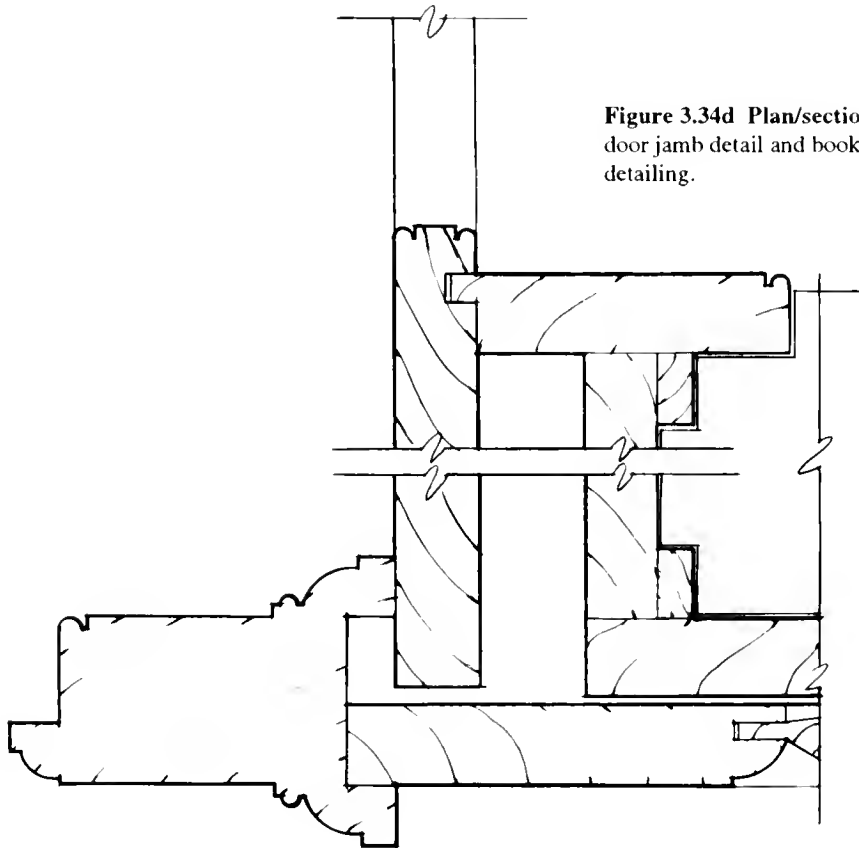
Plan/section Study door jamb detail and bookcase detailing.
